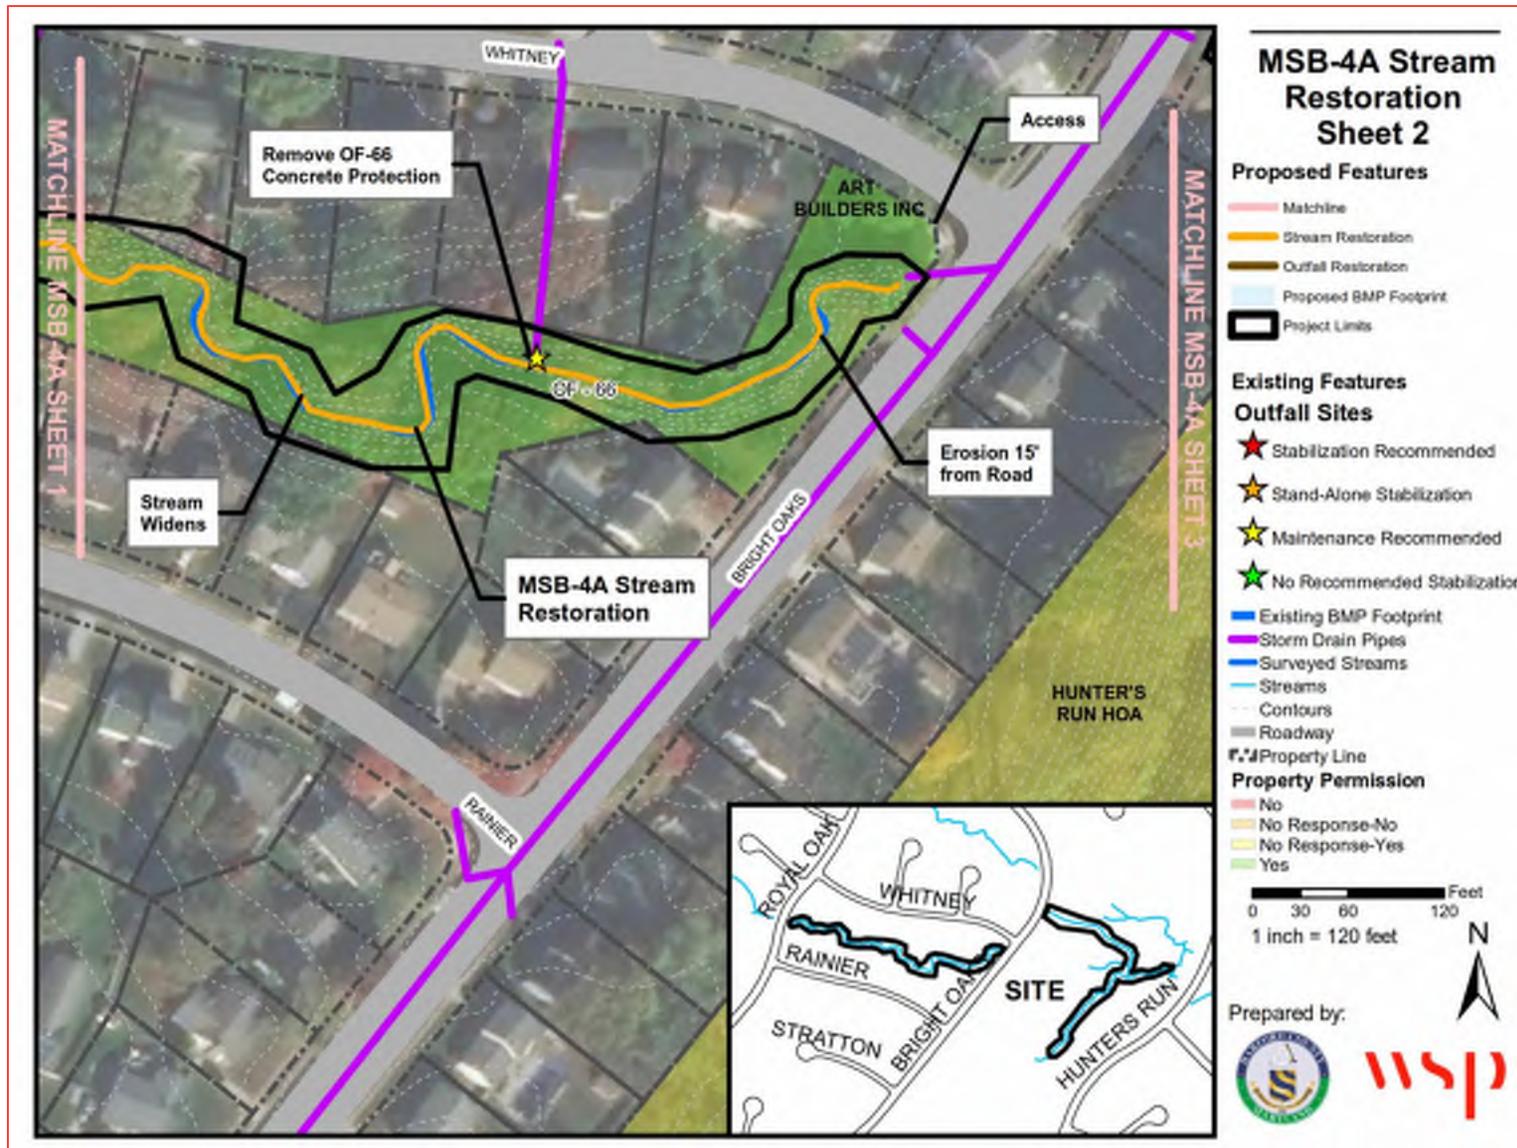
Site Location and Proposed Plan for MSB-4A Stream Restoration (Sheet 2 of 3)
